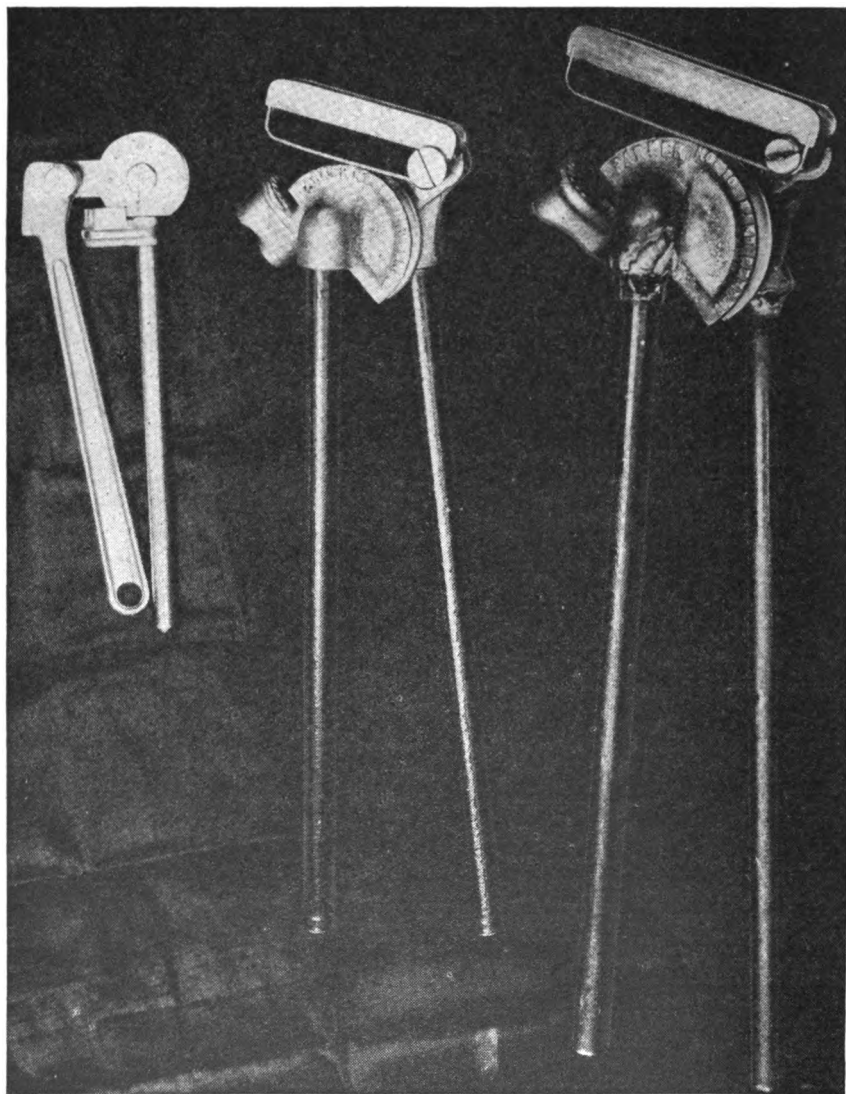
Hand bending machines for three different sizes of conduit.
